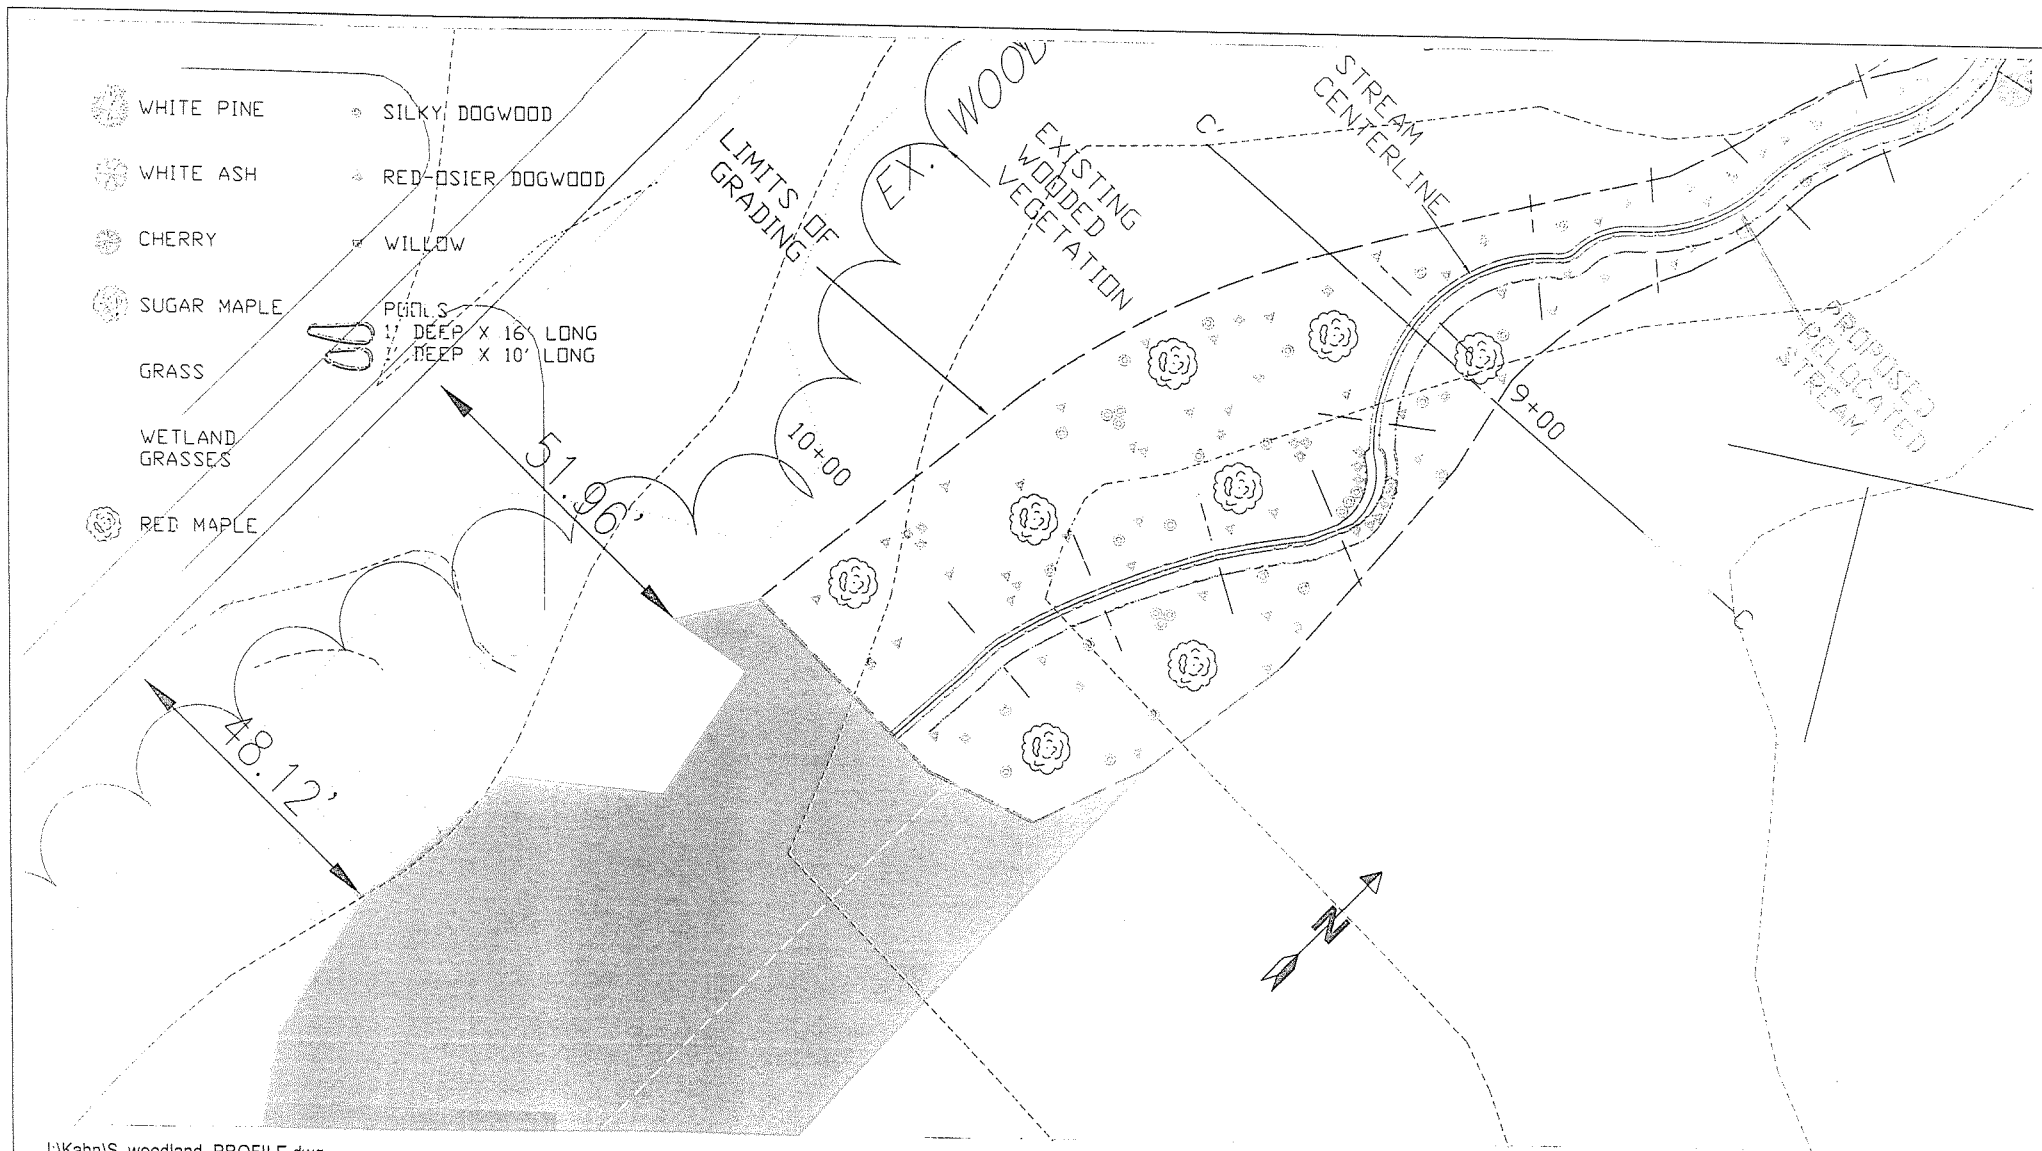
PLAN VIEW OF MAIN STREAM
